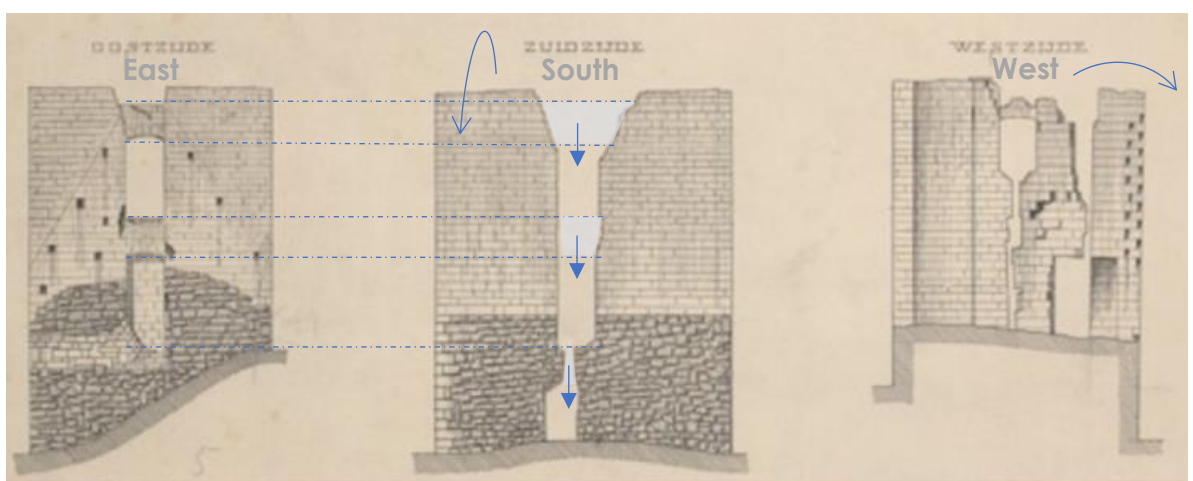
Mechanism failure of southern wall, arches above openings collapsed after out of plane translation of part of the wall. Adapted from (Anonymous, Gevelaanzichten, 1881b).
